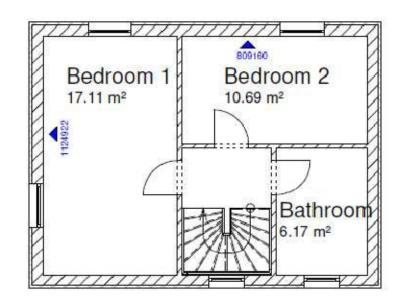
Plan of the first floor of KLG Hagedorn, House 3 showing the data logger locations
